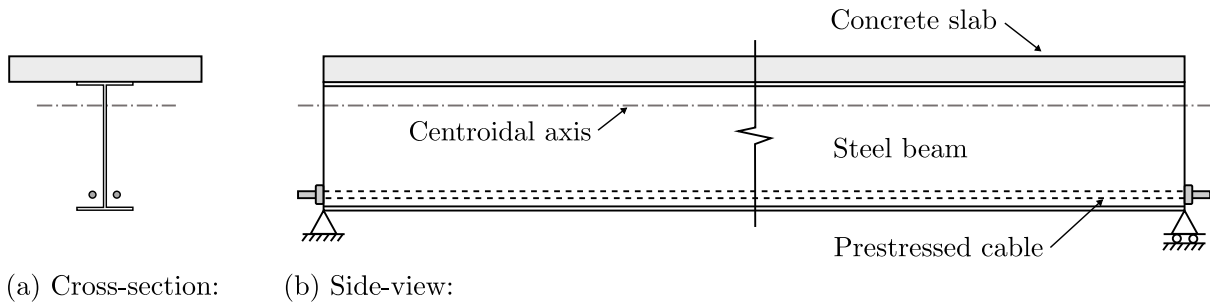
Illustration of a simply-supported prestressed steel–concrete composite steel beam.
